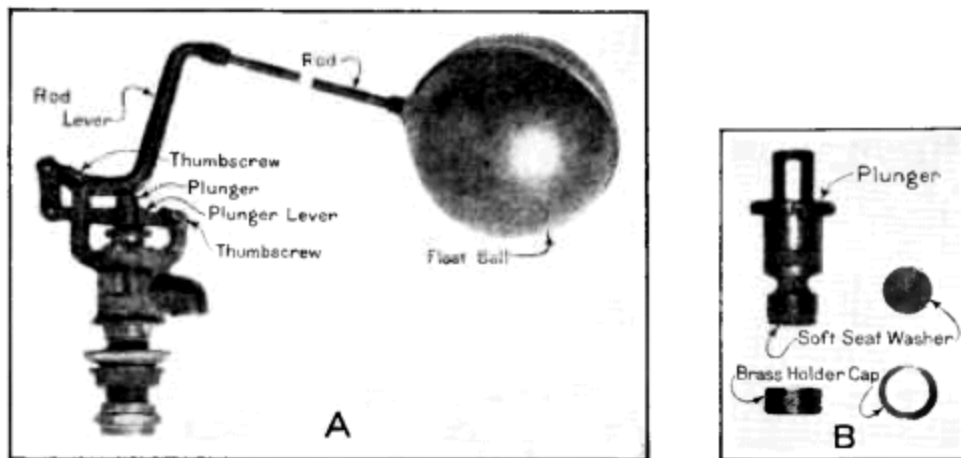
Ball cock; A, parts assembled; B, plunger, washer, and cap.
